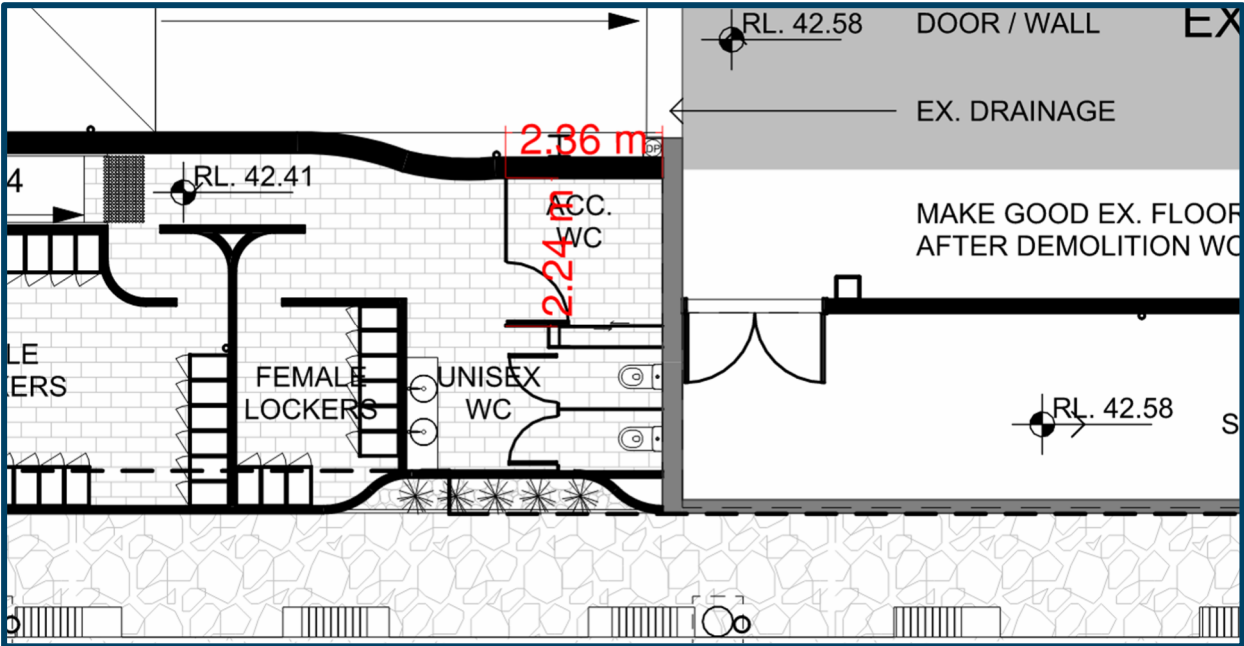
The proposed accessible bathroom on the Lower Ground Floor.
